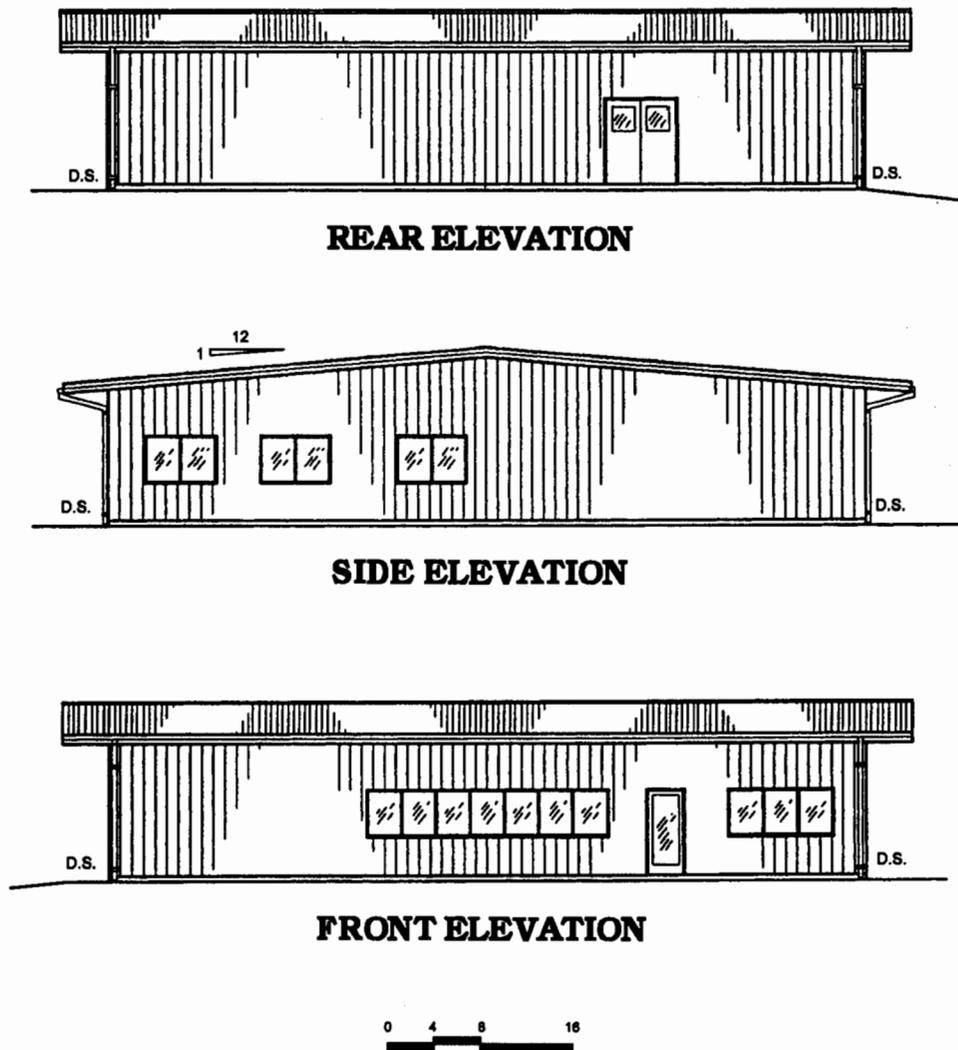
Elevation sketches of a potential preengineered metal collections facility at Edwards AFB.
